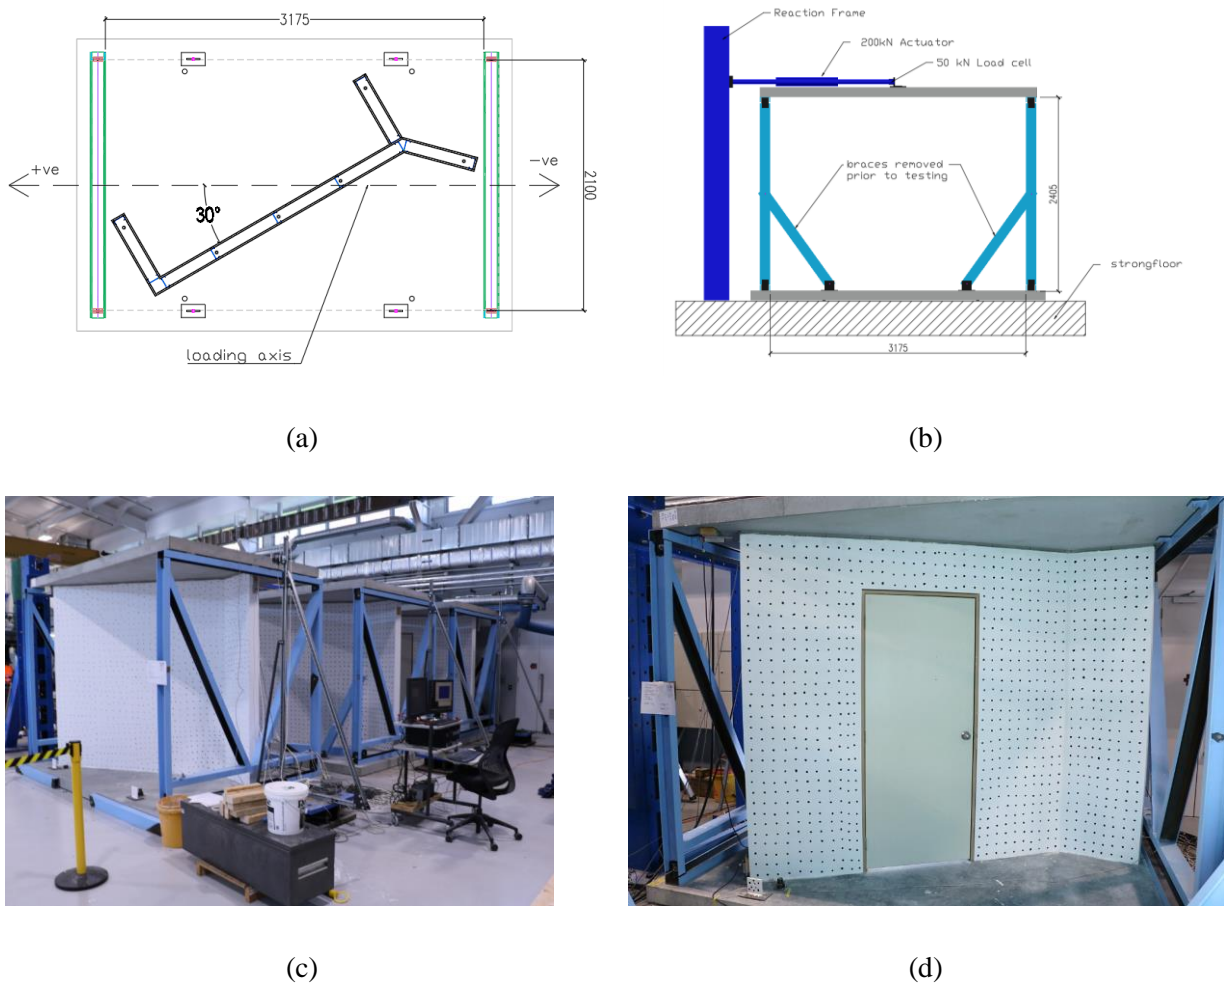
(a) Plan of testing frame (mm); (b) Elevation of testing frame (mm); (c) Photograph of setup; (d) Photograph of specimen A3 (doorway specimen).
